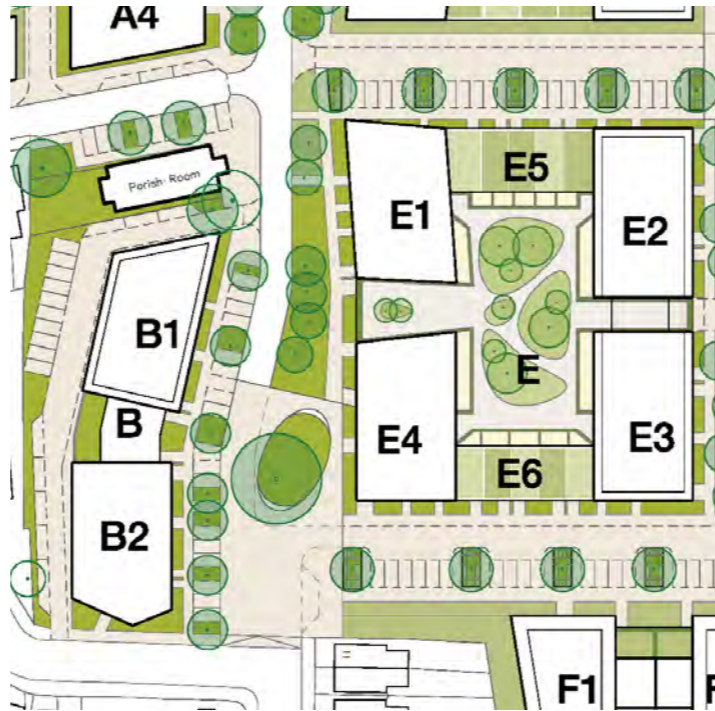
Version A: Bid Stage Ground floor plan. Buildings B and E
